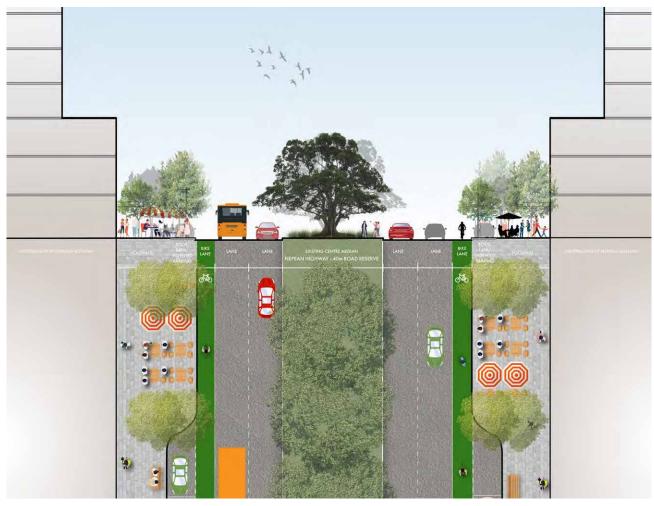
Example plan and cross section showing how Nepean Highway could be transformed
